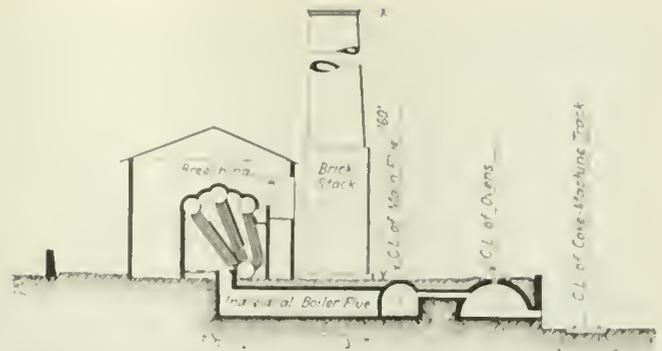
CROSS-SECTION OF OVENS, FLUES, BOILER AND BOILER HOUSE
